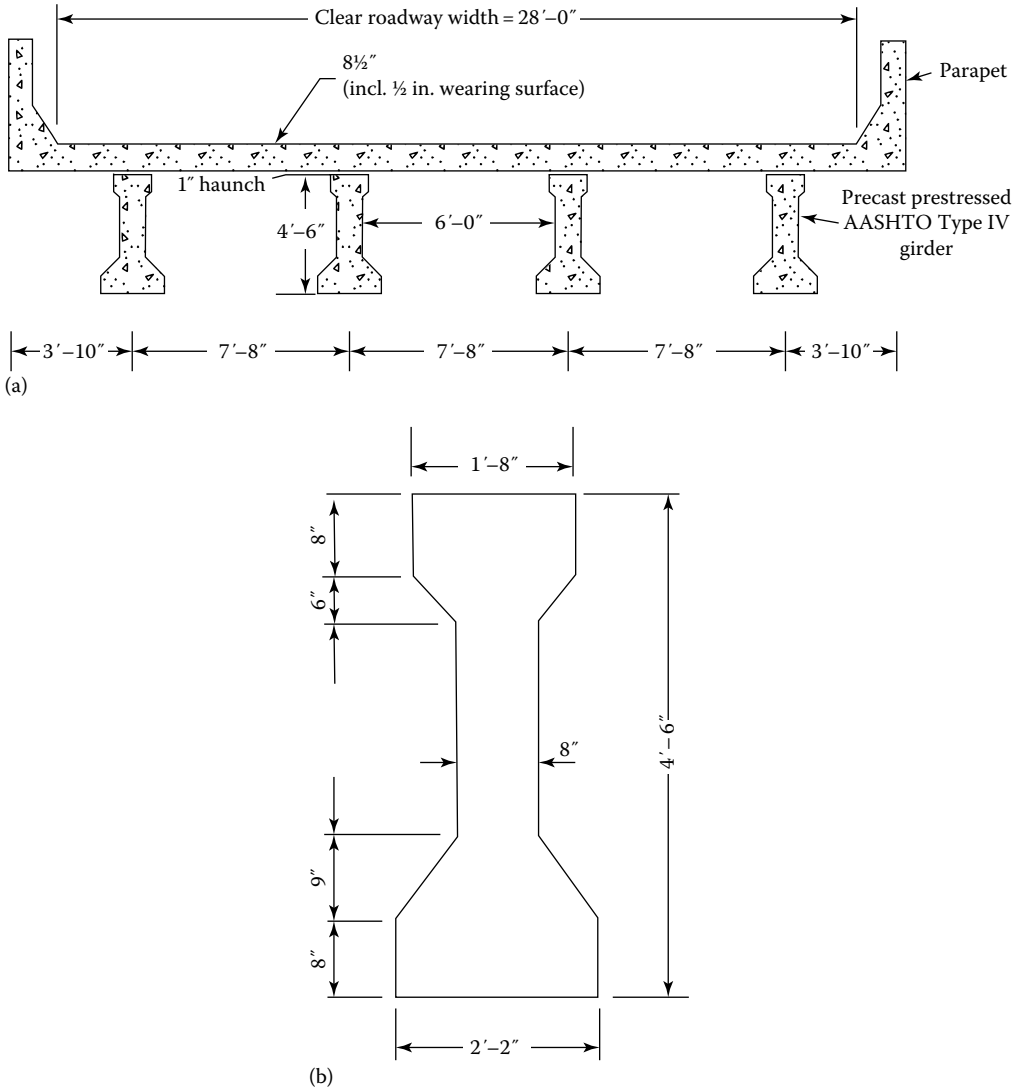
(a) Cross section of bridge with AASHTO Type IV prestressed concrete girders. (b) Cross section of AASHTO-PCI precast-prestressed concrete Type IV girder.
